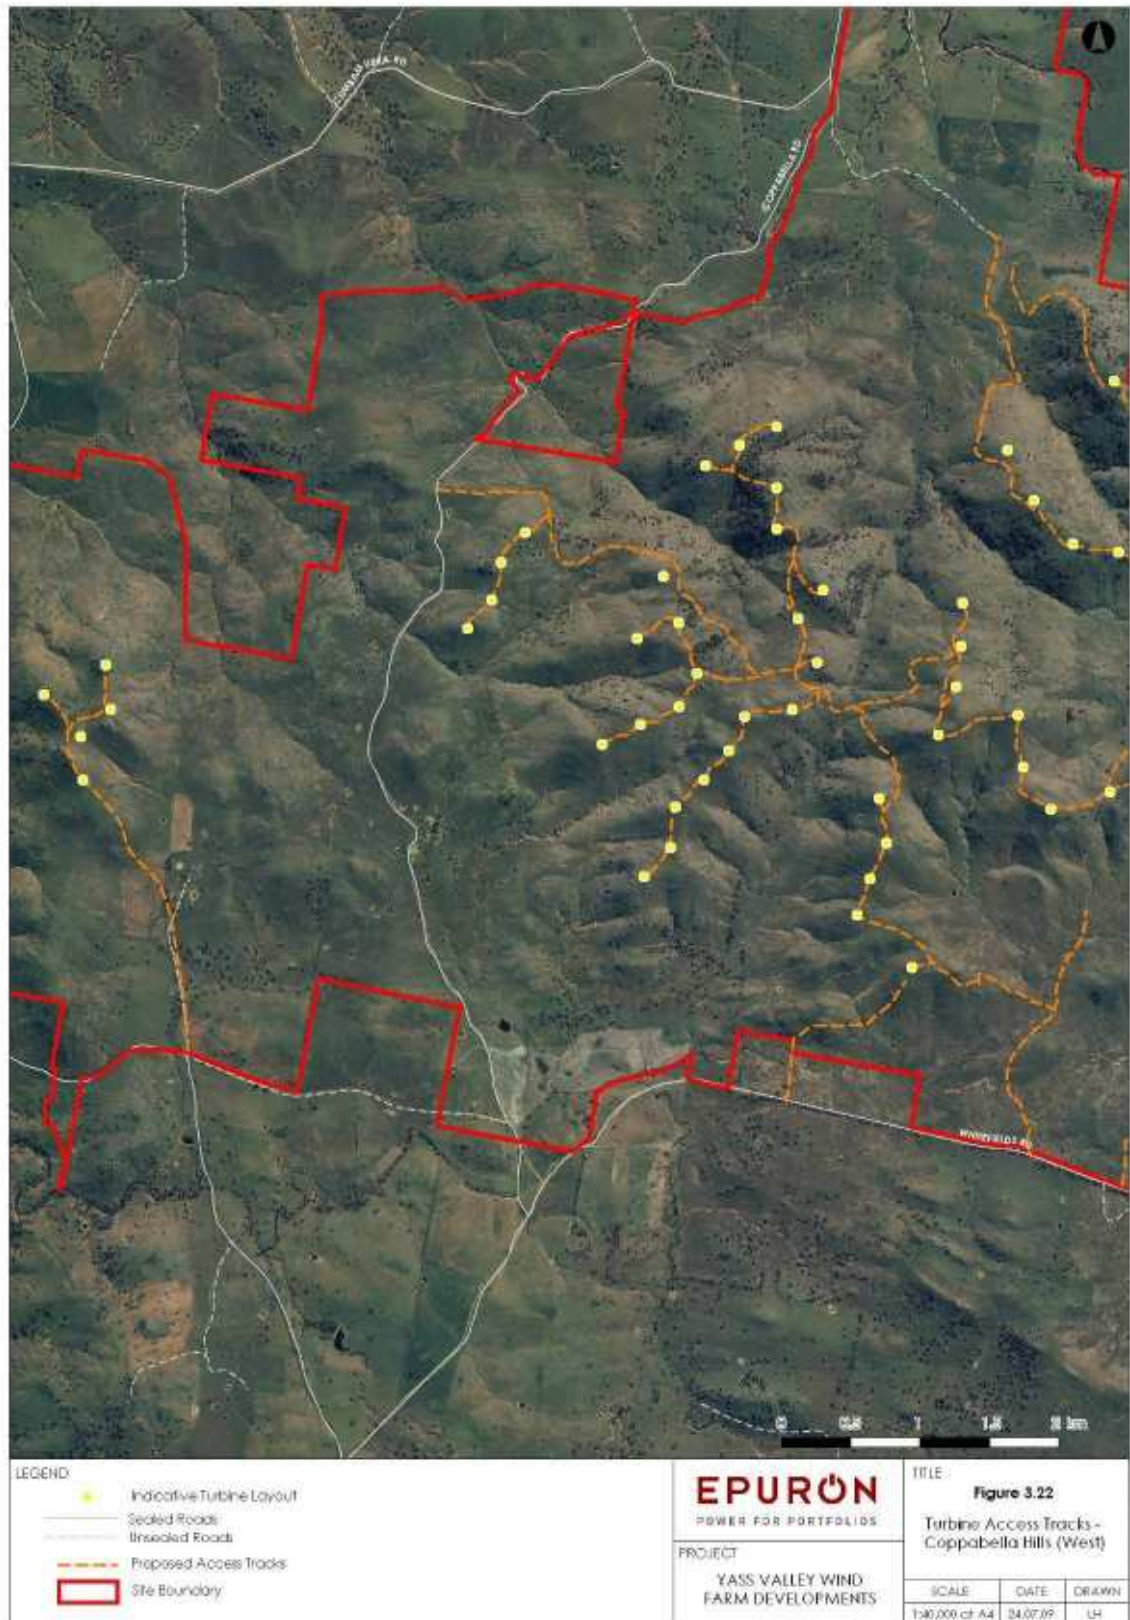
Shows an indicative track layout based on the current turbine layout and preliminary design principles.
